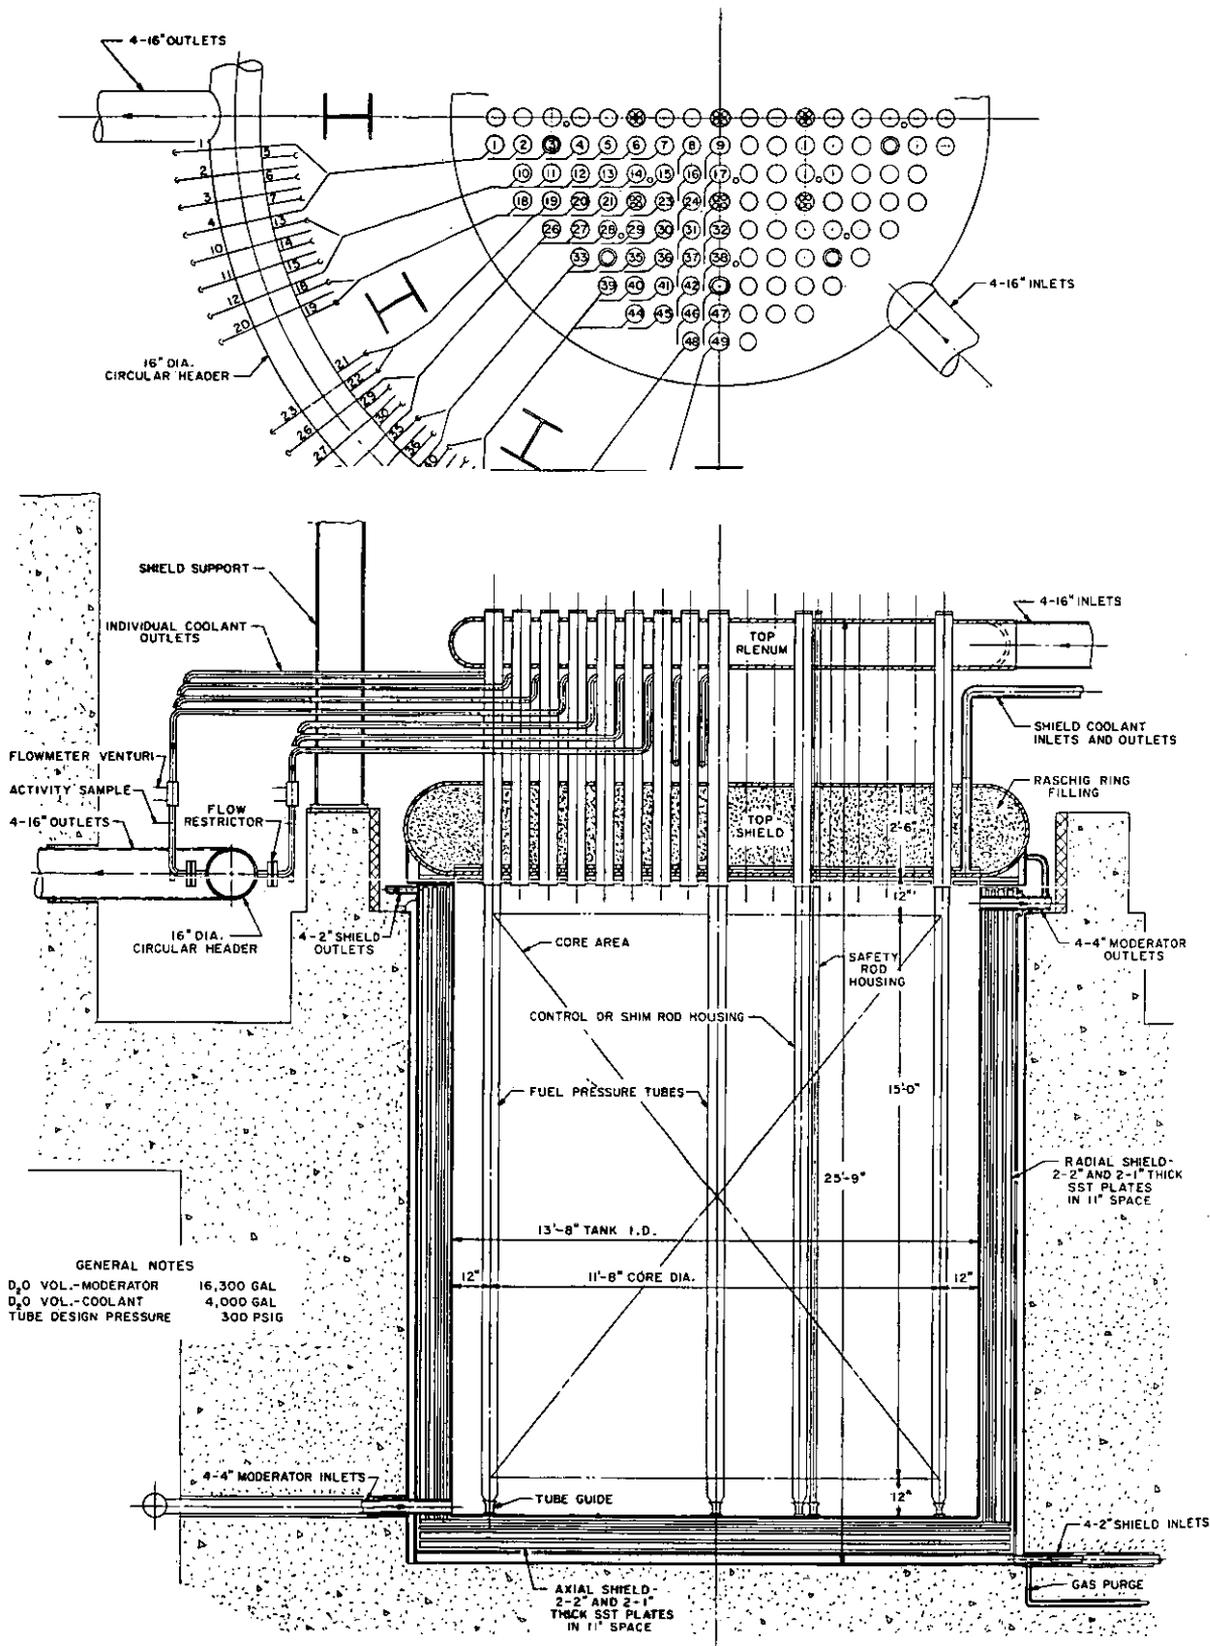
PRESSURE TUBE REACTOR - BOILING D₂O COOLED - COLD MODERATOR
